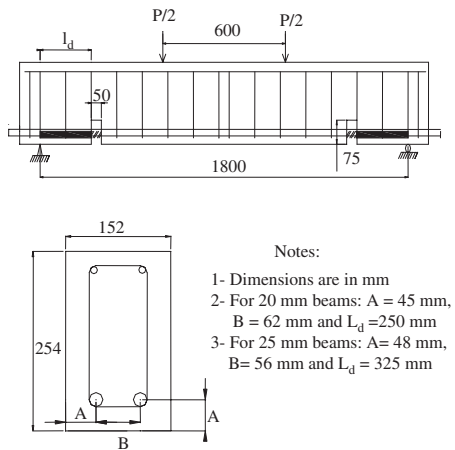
Longitudinal and cross-sectional details of a bond-beam specimen.
